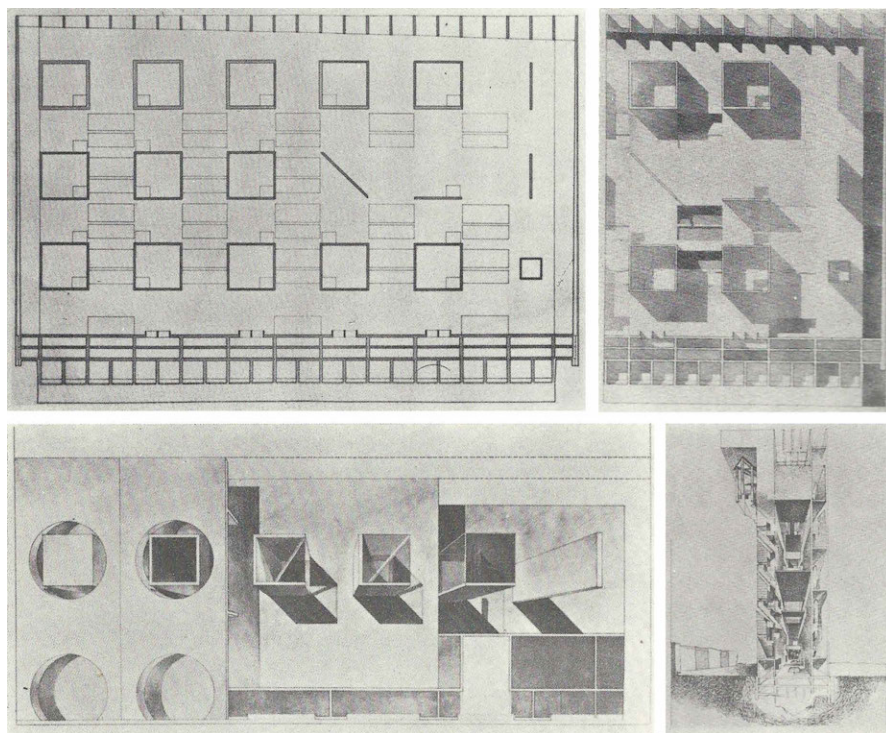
From top to bottom, left to right: Longitudinal section; Longitudinal section (detail); Series of cubes (detail); Perspective cross section.
